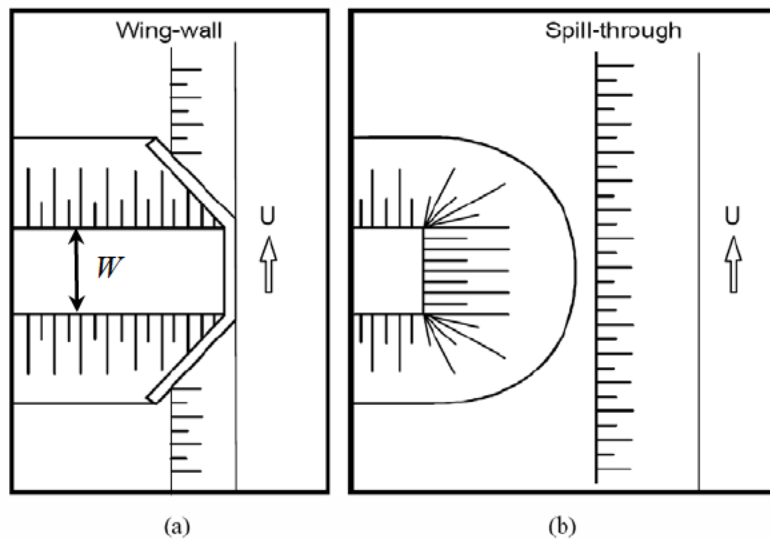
Plan views of the two common abutment forms: (a) Wing-wall; (b) Spill-through (Ettema et al. 2010).
